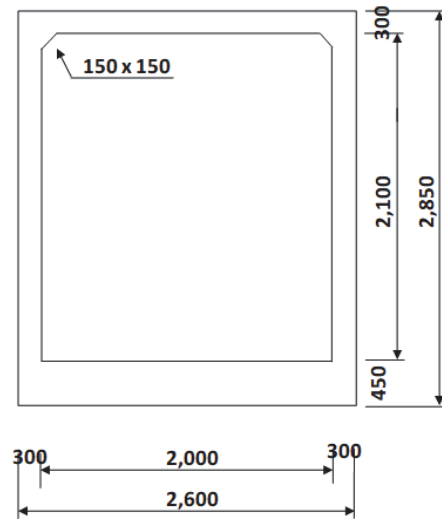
Sectional dimension of a power cable tunnel specimen 1.
